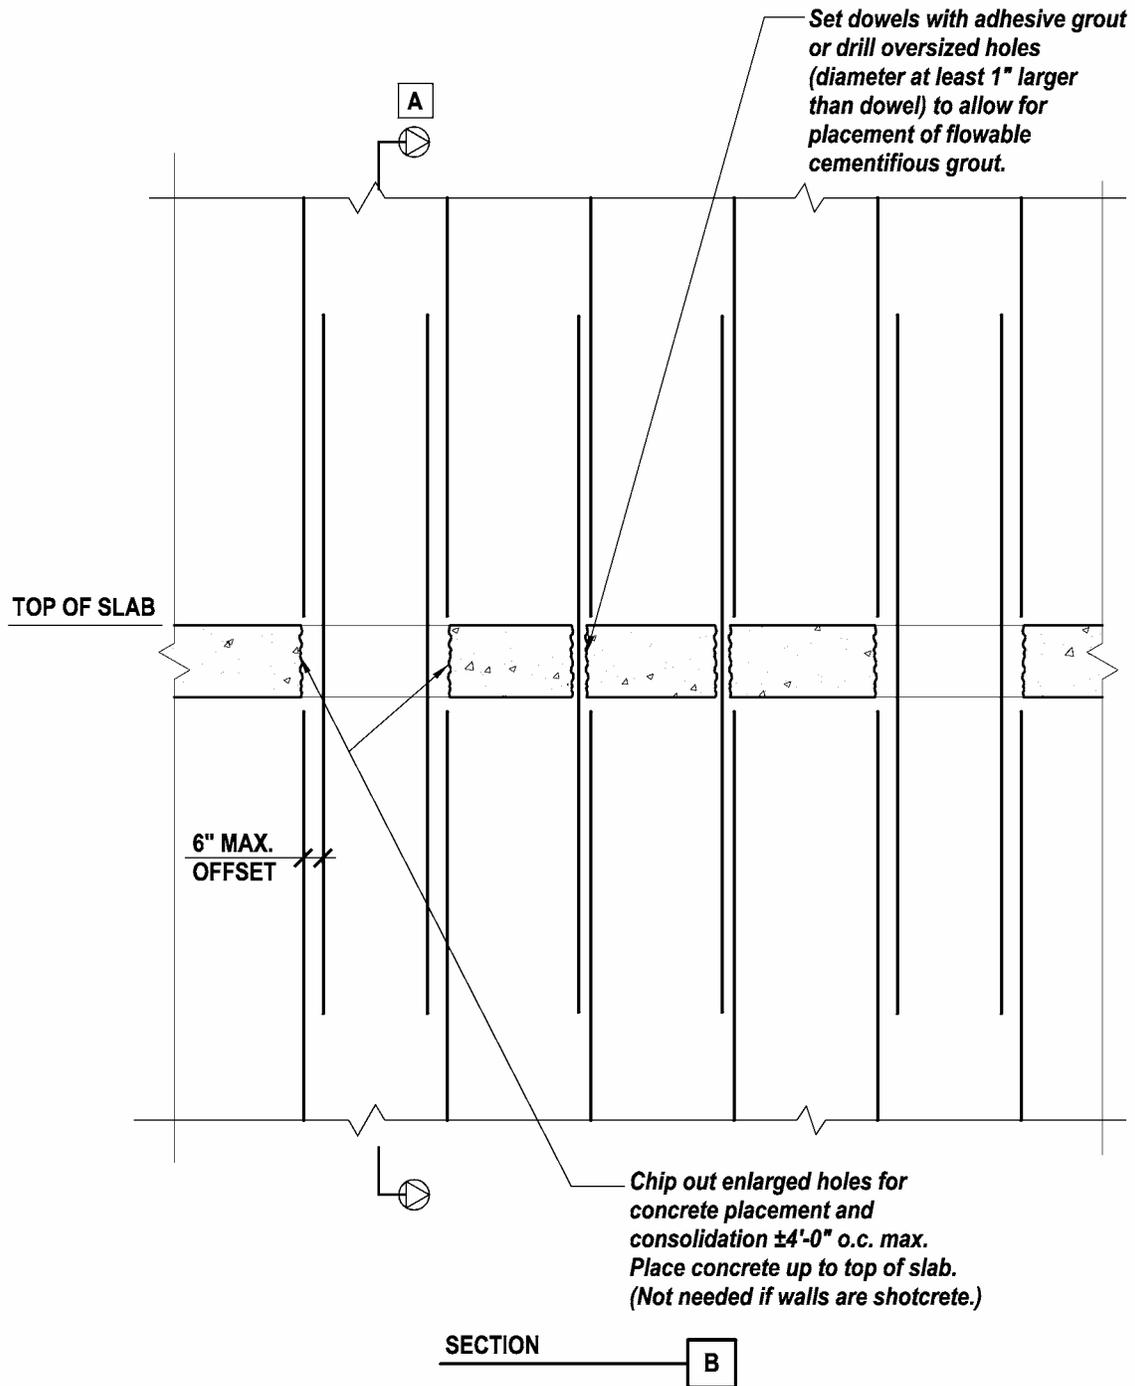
B: Concrete Wall Connection to Concrete Slab – Partial Elevation View
